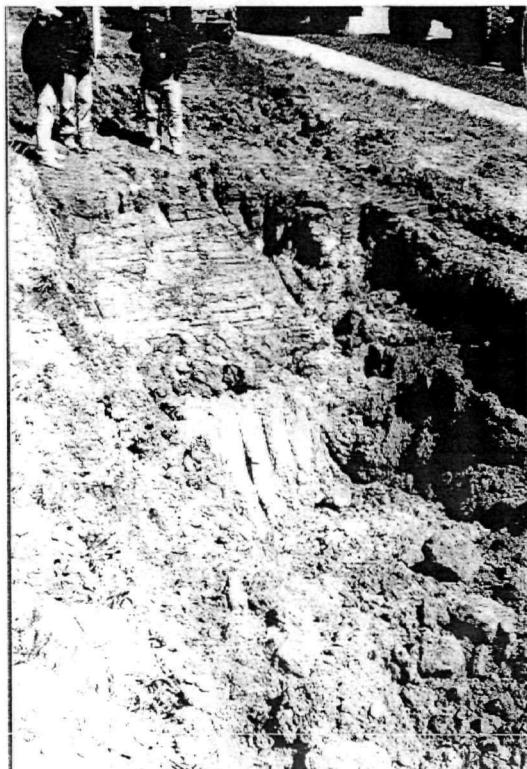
(Facing north east). The repair to the slurry wall was made in three increments. The second repair increment is being excavated here. Where the people are standing is the first repair increment, which has received compacted clay repair material.
